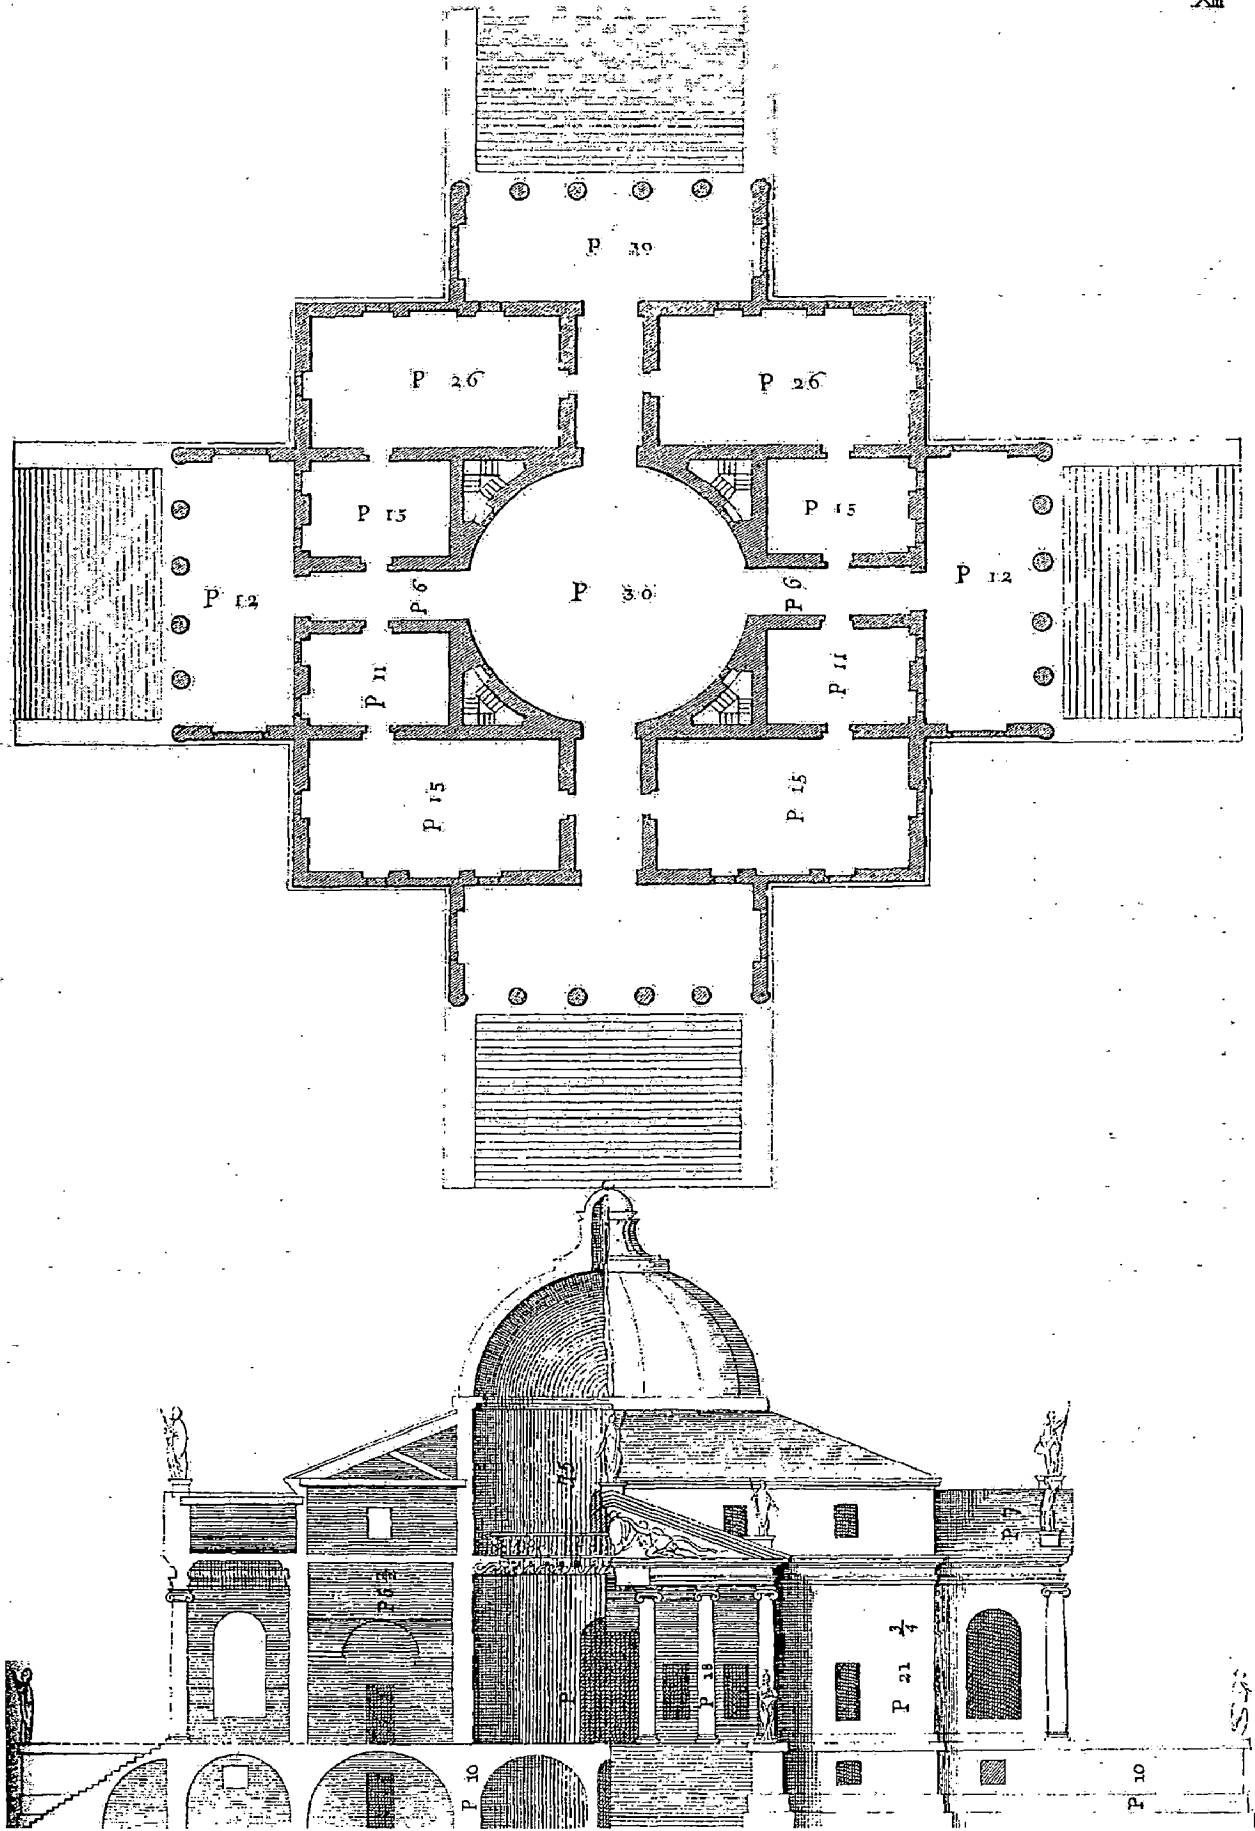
Villa Paolo Almerico near Vicenza in plan and half-elevation half-section
